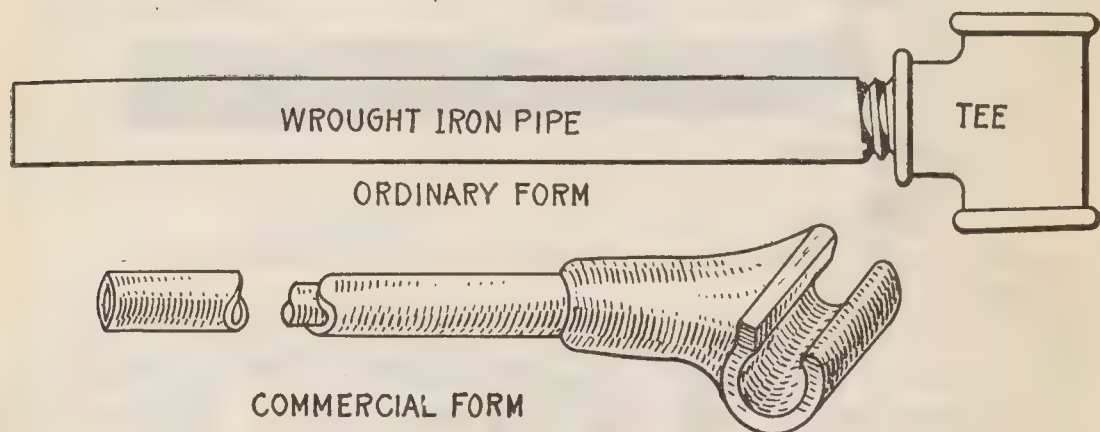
,280.—Ordinary form of hickey or conduit bender. *It consists of* a piece of one inch wrought pipe about three feet long with a one-inch cast iron tee screwed on to one end of the pipe. This device is used as follows: the conduit to be bent is placed on the floor and the tee slipped over it. The workman then places one foot on the conduit close to the tee, and pulls the handle of the bender towards him. As the bending progresses, the workman should take care to continually move the bender away from himself, to prevent the buckling of the conduit.
